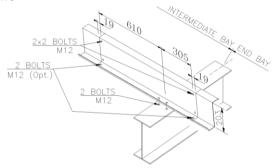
double overlap in first intermediate bay for 203 mm sections
